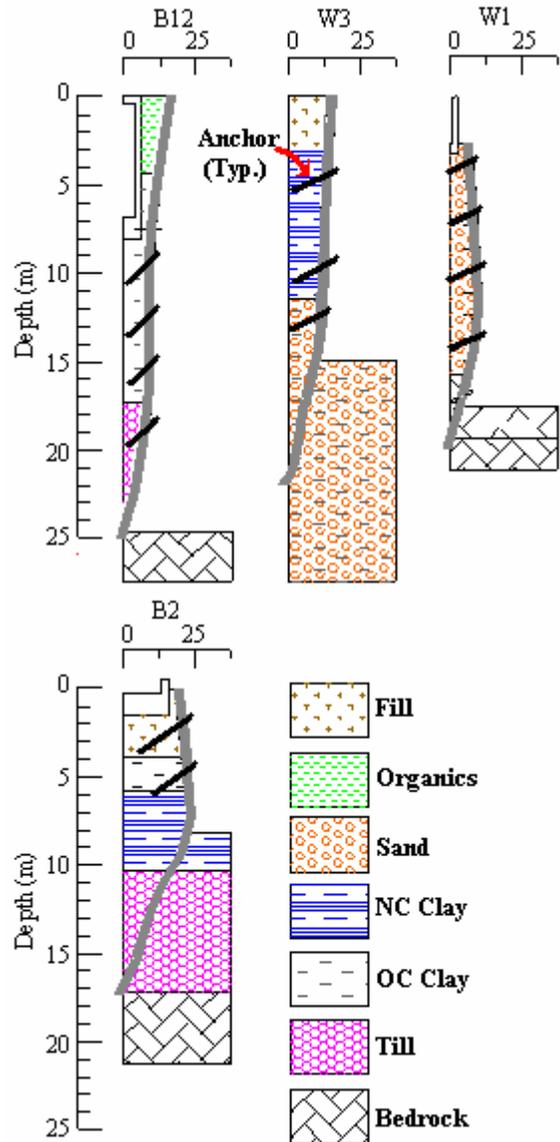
Typical sections and wall deformations  $\delta H$  (mm) of anchor supported keyed wall excavations.
